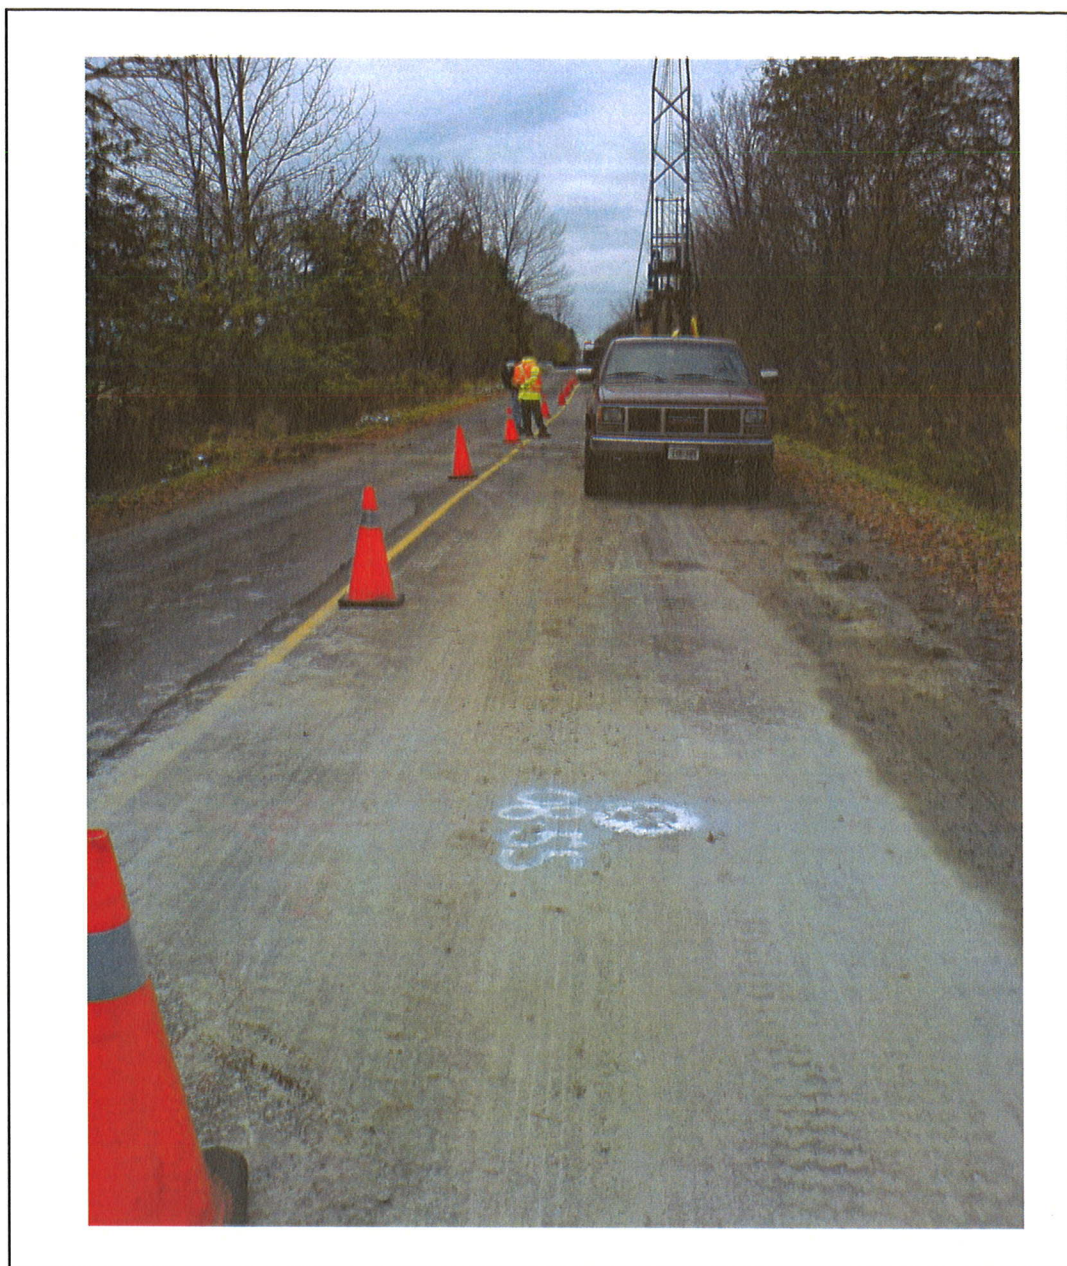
View of the site looking at Borehole 08-53, WBL of Doane Road
